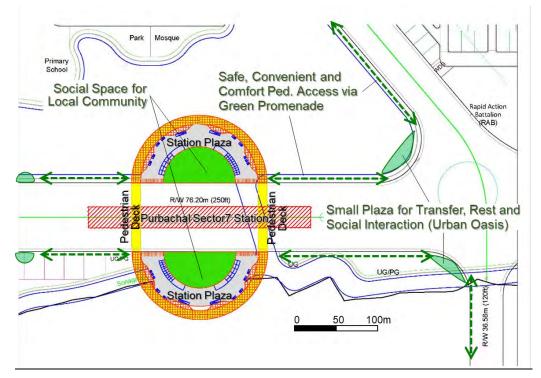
Proposed Station Plaza at Purbachal Terminal Station (Alternative 1)
